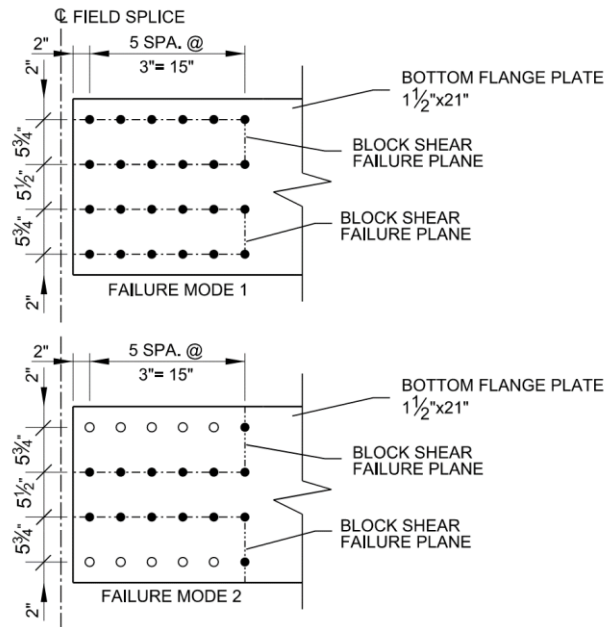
Bottom Flange Splice – Assumed Block Shear Failure Planes in the Flange on the Right-Hand Side of the Splice
